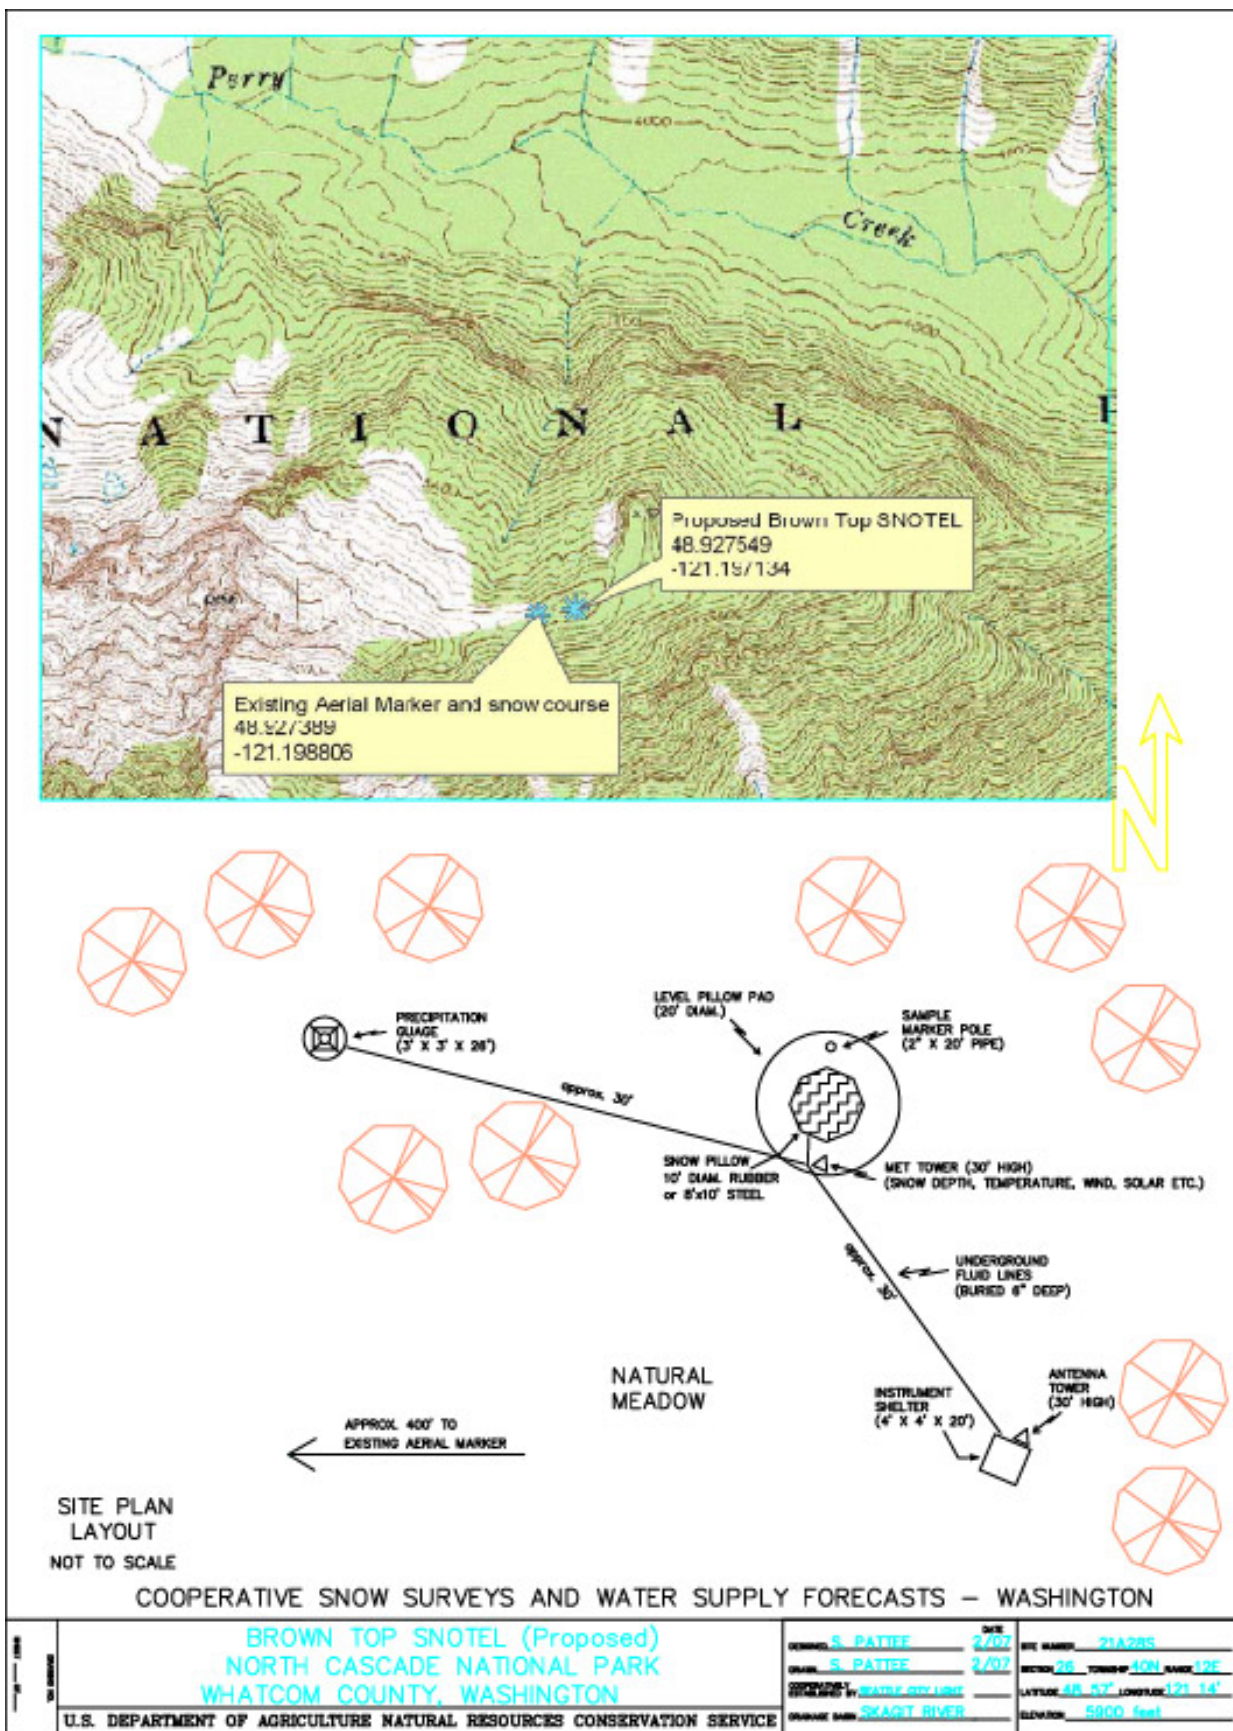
Site Layout of Proposed Browntop Ridge SNOTEL
